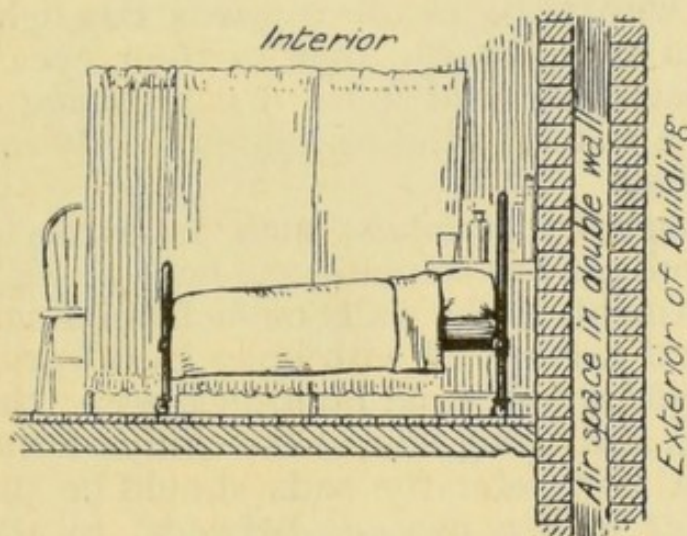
Showing air space in wall of building with head of bed against outside wall.
